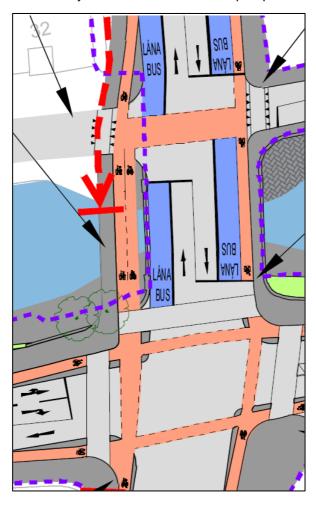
Proposed Widening of Robert Emmett Bridge Option A (EPR)
